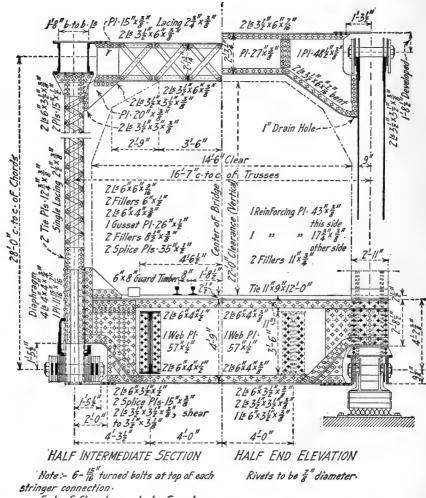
Single Track Through Pin-connected Railway Bridge.
